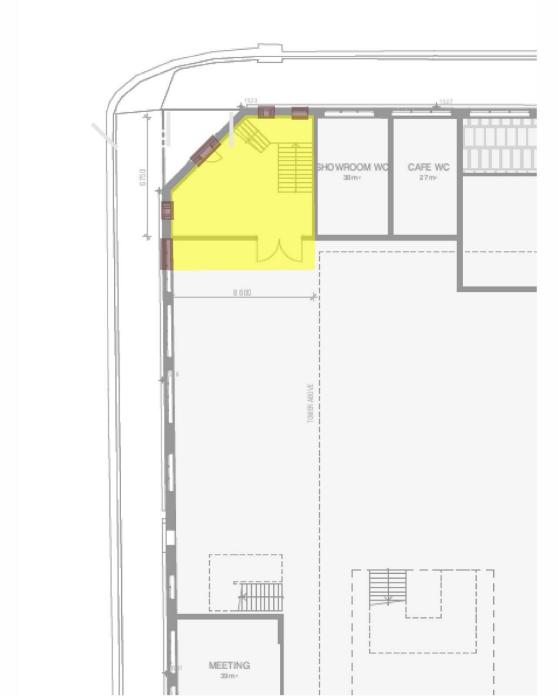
Treatment Scheme – Building A – Proposed Lobby
